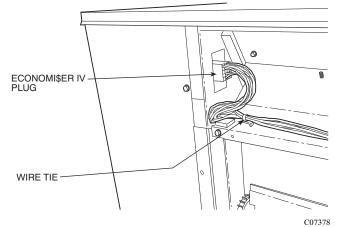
EconoMi\$er IV Assembled in Unit — Side View (13 to 25 Ton Units)
